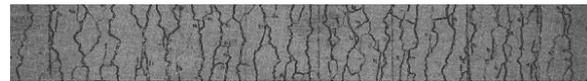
The crack of concrete beam test by TLS.
